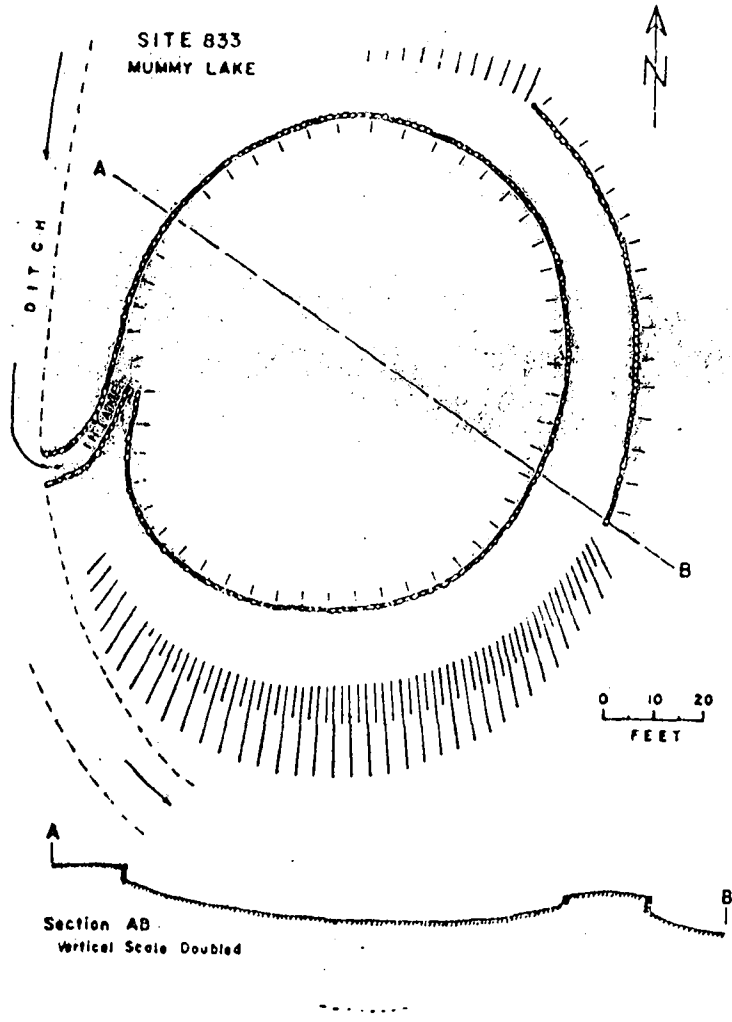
Plan and Section of Mummy Lake at Chapin Mesa (Source: Rohn, 1963)
